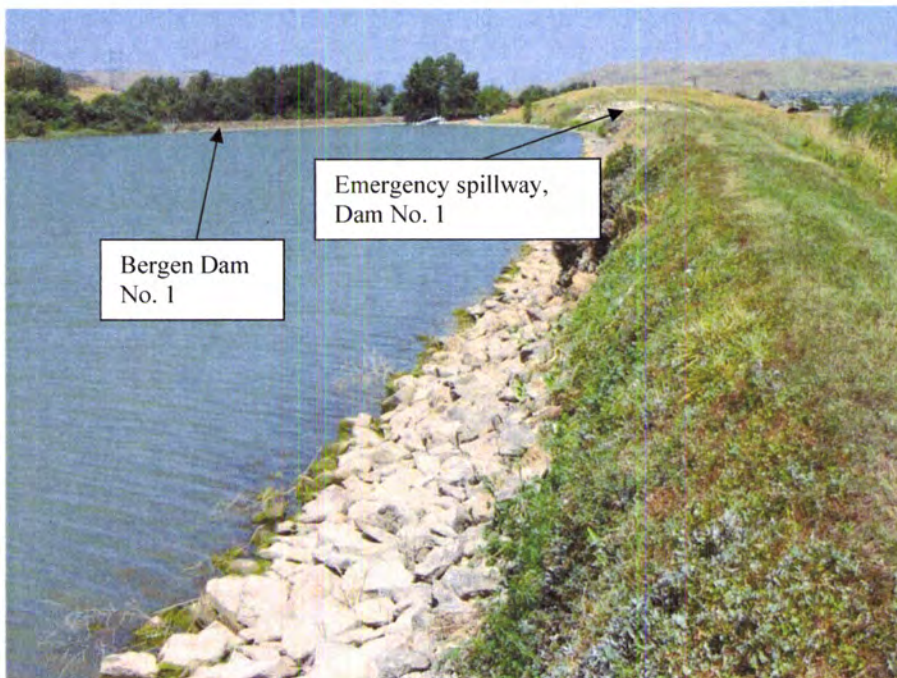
Upstream slope of the dike, looking south. Upper slope of the dike is grass lined, and very steep. Bergen Dam No. 1 and its emergency spillway can be seen in the background.
